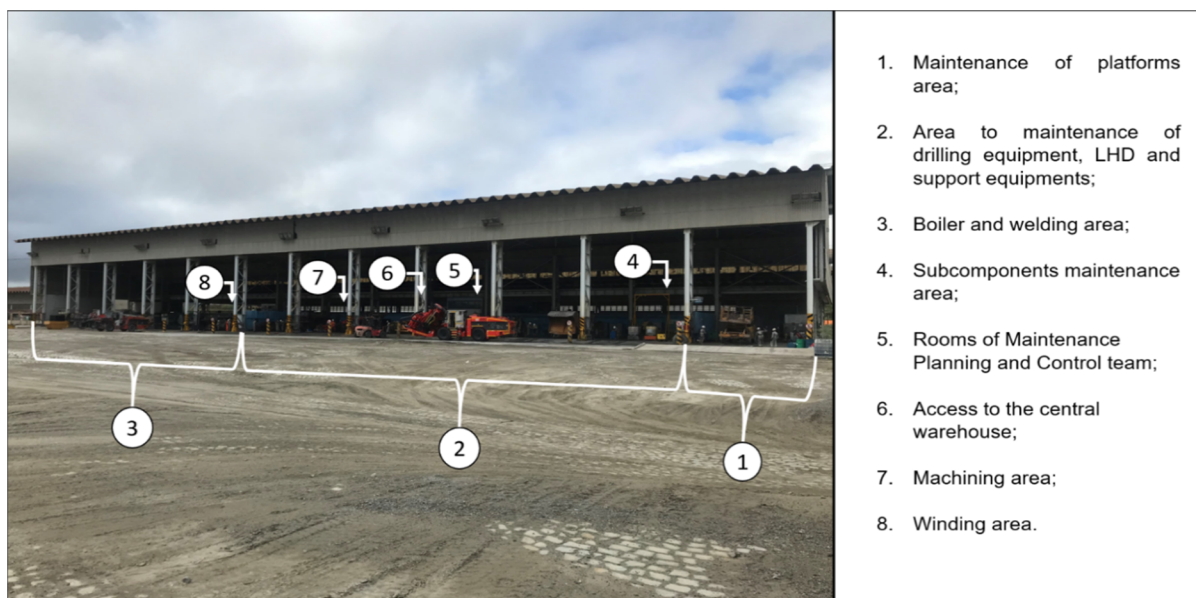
Central Maintenance Facility on Surface, Pilar Mine (MCSA, 2020)
